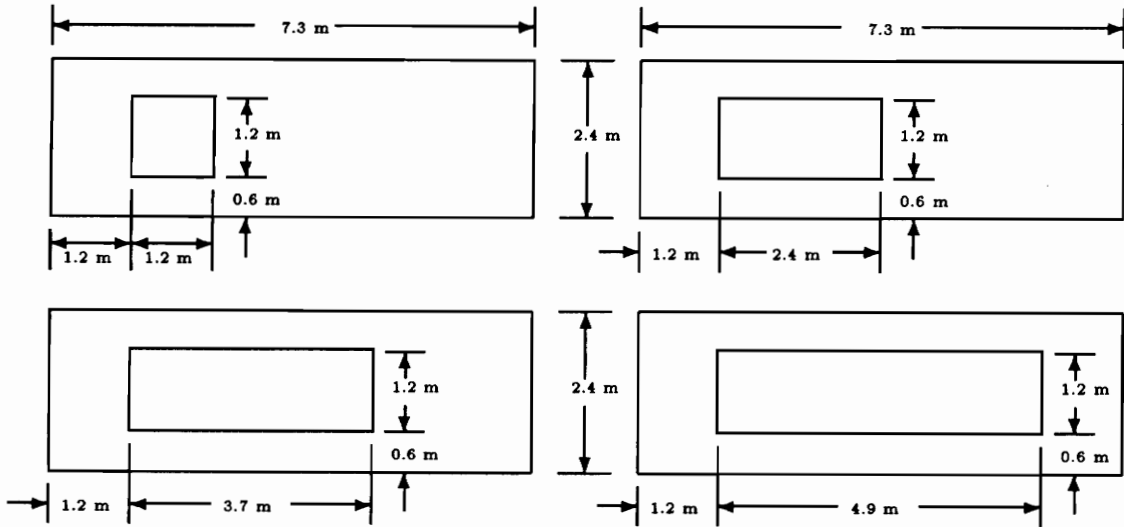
Dimensions of 2.4 m (8 ft) High Wall Models with Window Openings
